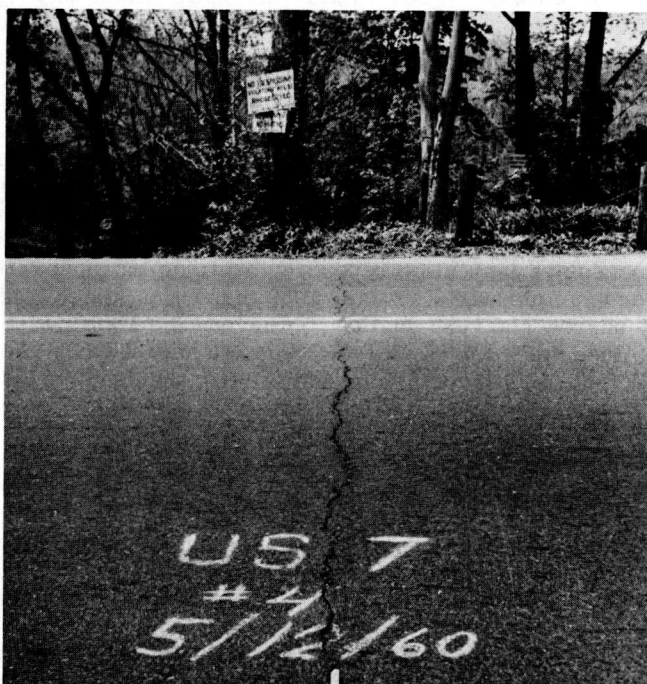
Uncontrolled Joint Crack Project No. 1—Route US 7, Norwalk, May 12, 1960.
